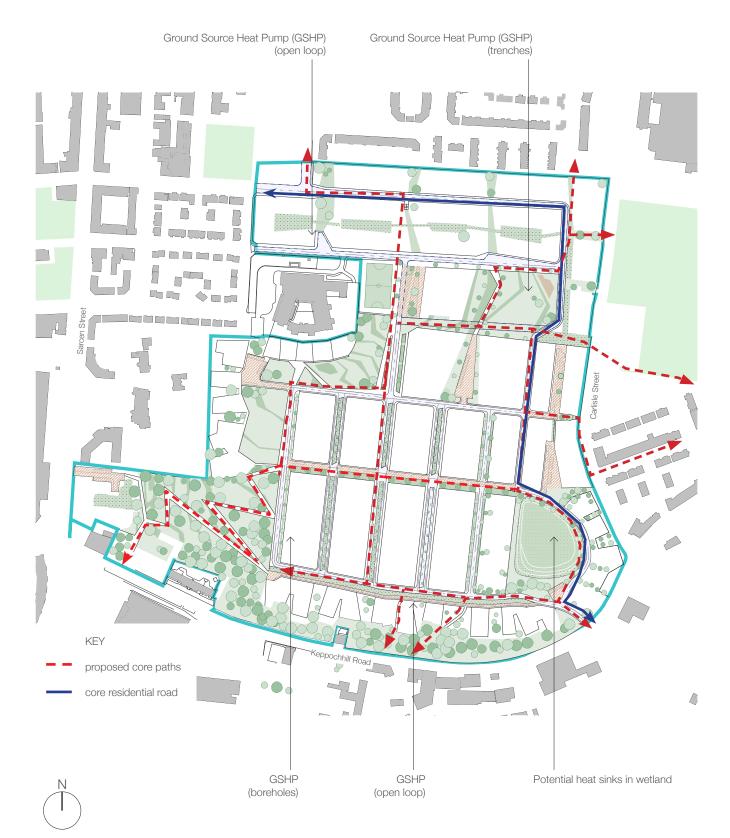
Proposed road and pedestrian network. Collective Architecture 2010. Not to scale.
